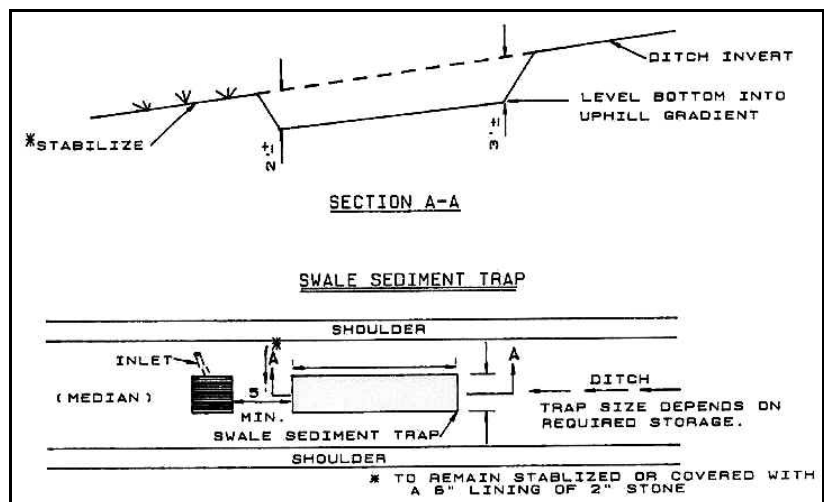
Swale outlet sediment trap details (*Empire State Chapter Soil & Water Conservation Society, 1991*).
